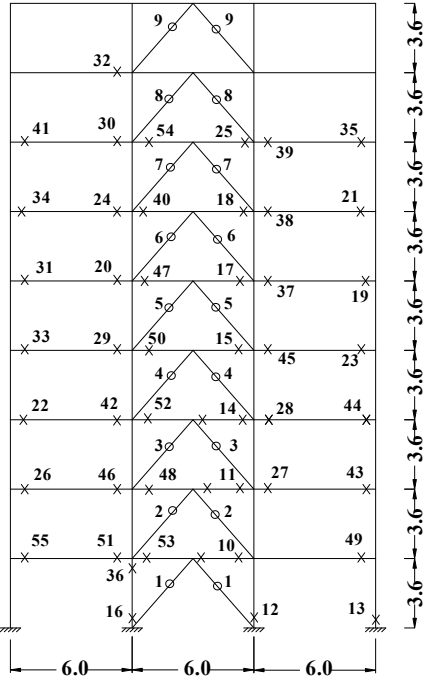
The sequence of core concrete crushing and yielding of bracing of Frame 1 (record no. 18)
